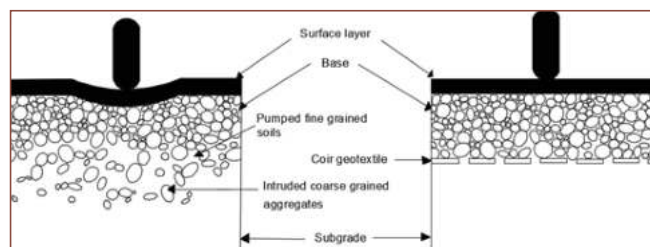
Pavement Section with Coir as Separation Layer and without Coir Separation Layer
